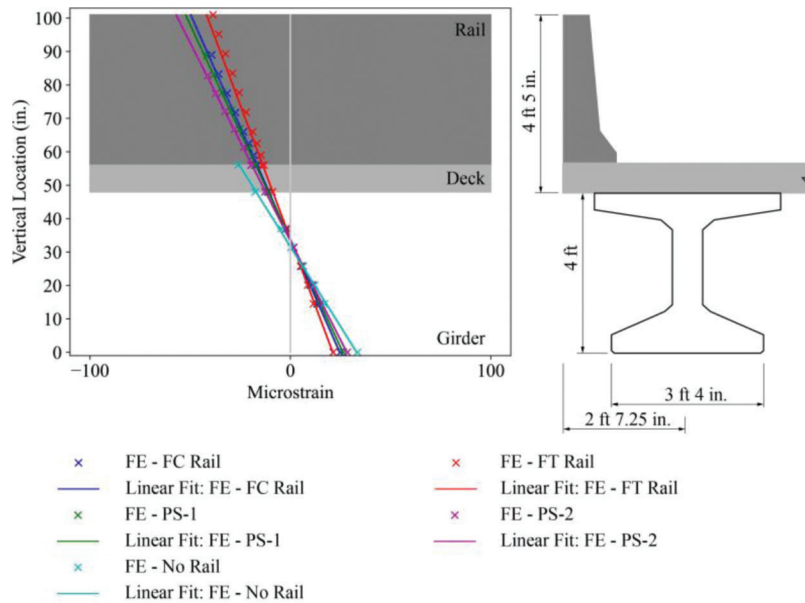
Effect of rail type for two-span continuous prestressed concrete girder bridge: FE predictions for strains at peak positive moment location. Cross-section shows the FT rail as an example.
